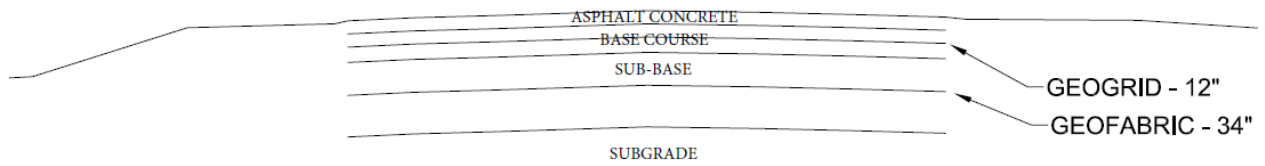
The as-built cross section of the test section FWD6-1. Horizontal scale is equal to vertical scale.
